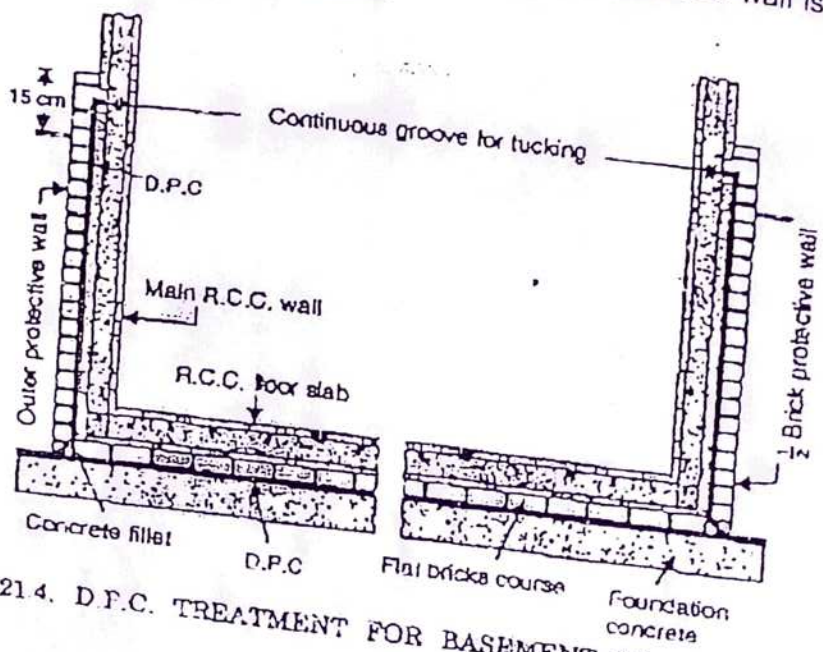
D.P.C. TREATMENT FOR BASEMENT IN DAMP SOIL.
